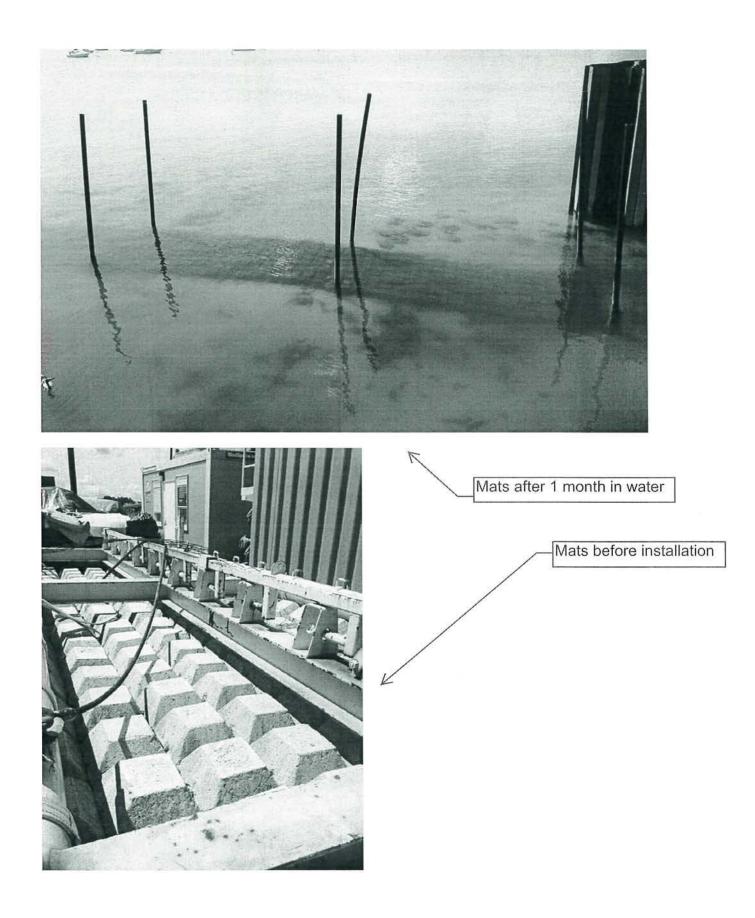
NIMBLE HILL ROAD, NEWINGTON (SHEET 1 OF 3)
